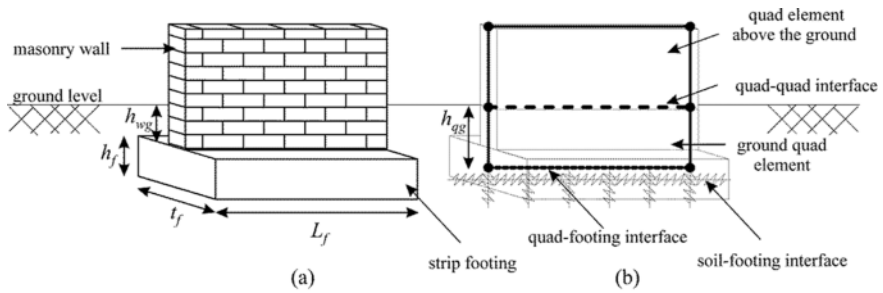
Modelling of embedded masonry sections: (a) footing detail, (b) quad-footing interface detail.
